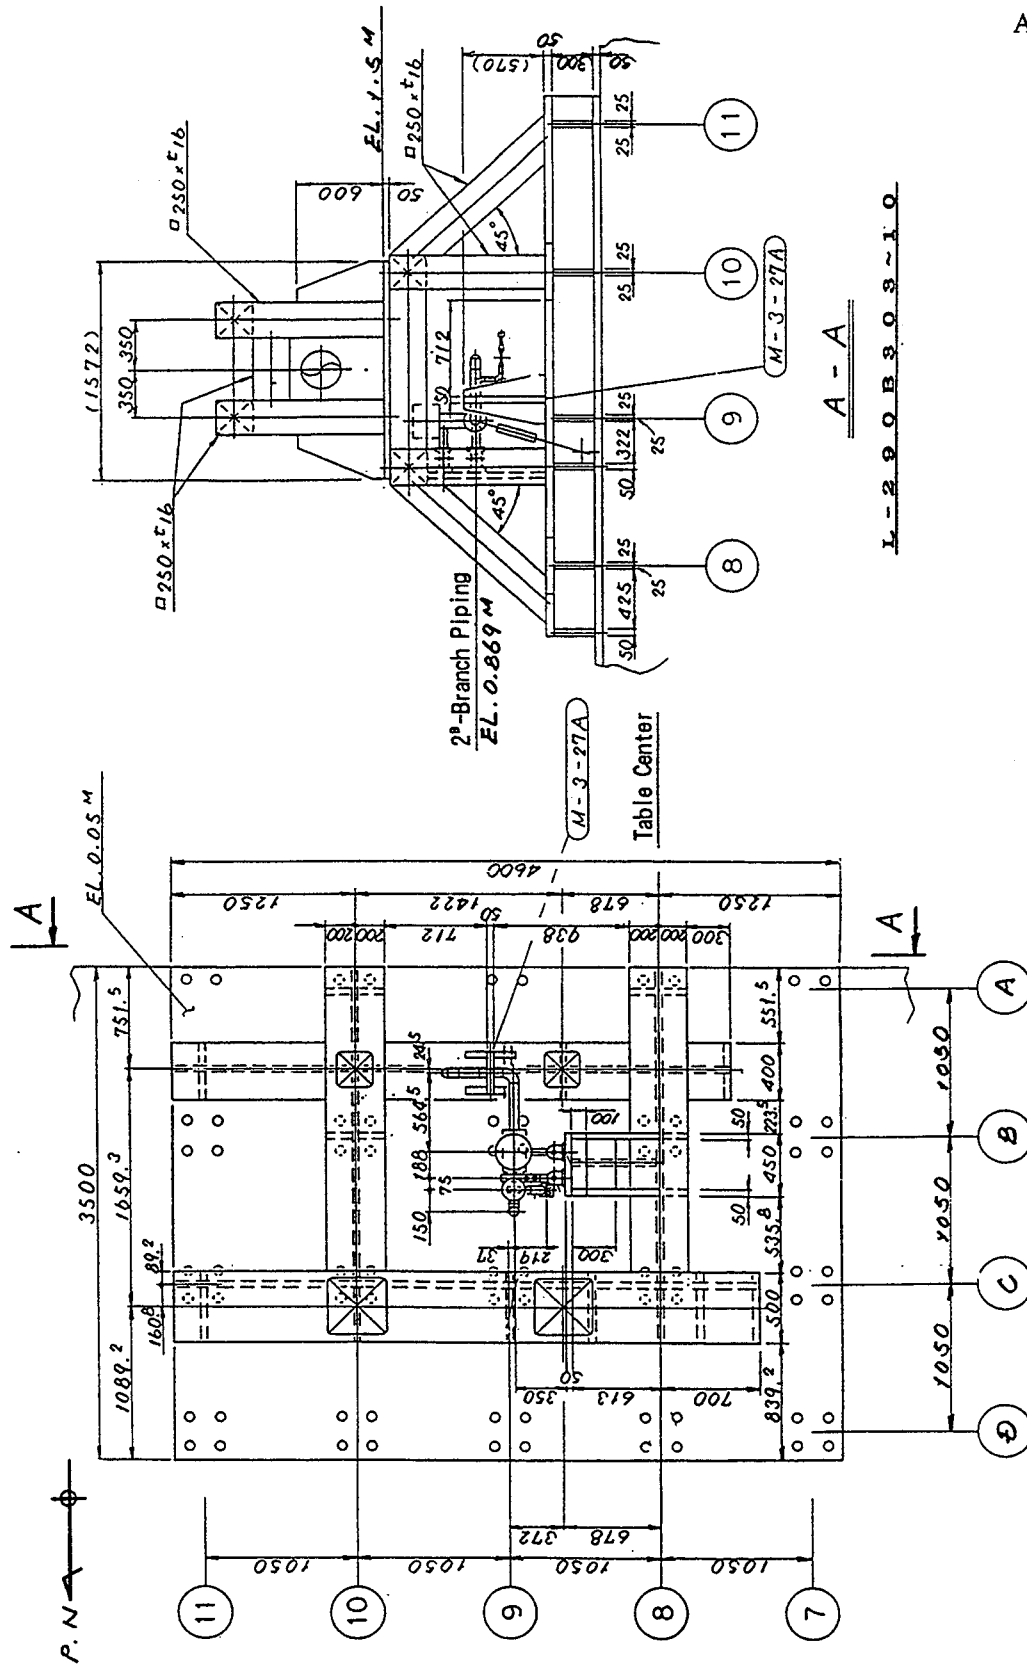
Schematic Drawing of Support Structure (branch piping end support)
